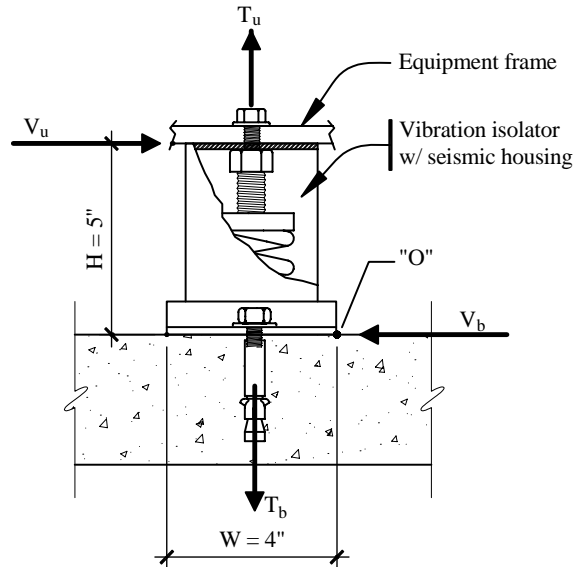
Anchor and snubber loads for support on vibration isolation springs (1.0 in. = 25.4 mm).
